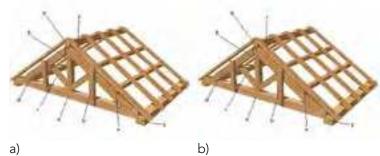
a) Japanese roofing structure – Nijubari Koyagumi; b) Western roofing structure - truss (credits: Mokuzoujikugumihou, Wikipedia. ip, 2011)
